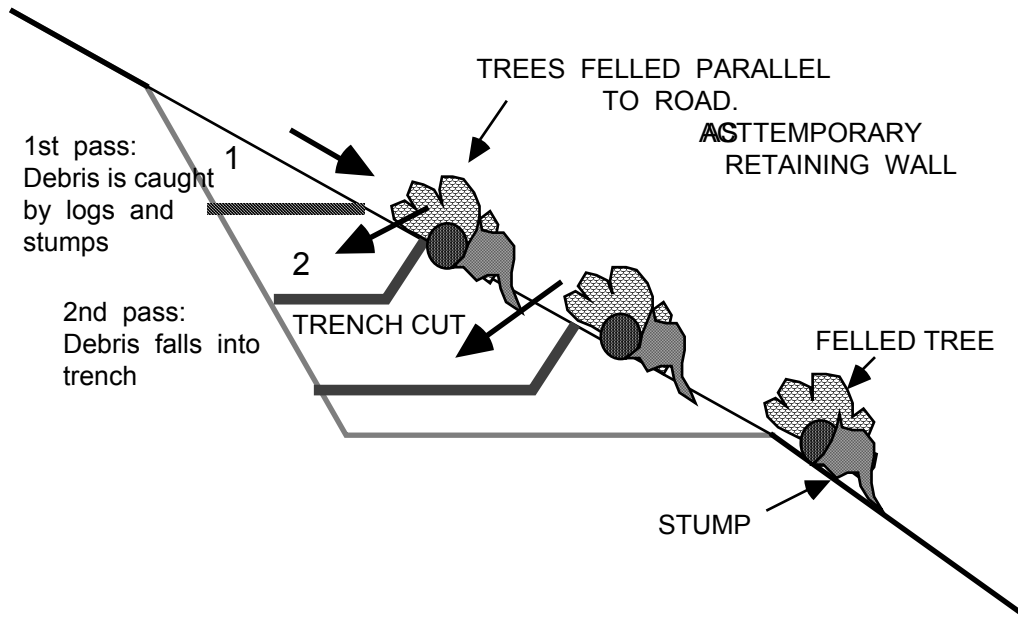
Trench-excitation to minimize sidehill loss of excavation material. Debris and material falls into trench in front of the dozer blade. Felled trees and stumps are left to act as temporary retaining walls until removed during final excavation.
